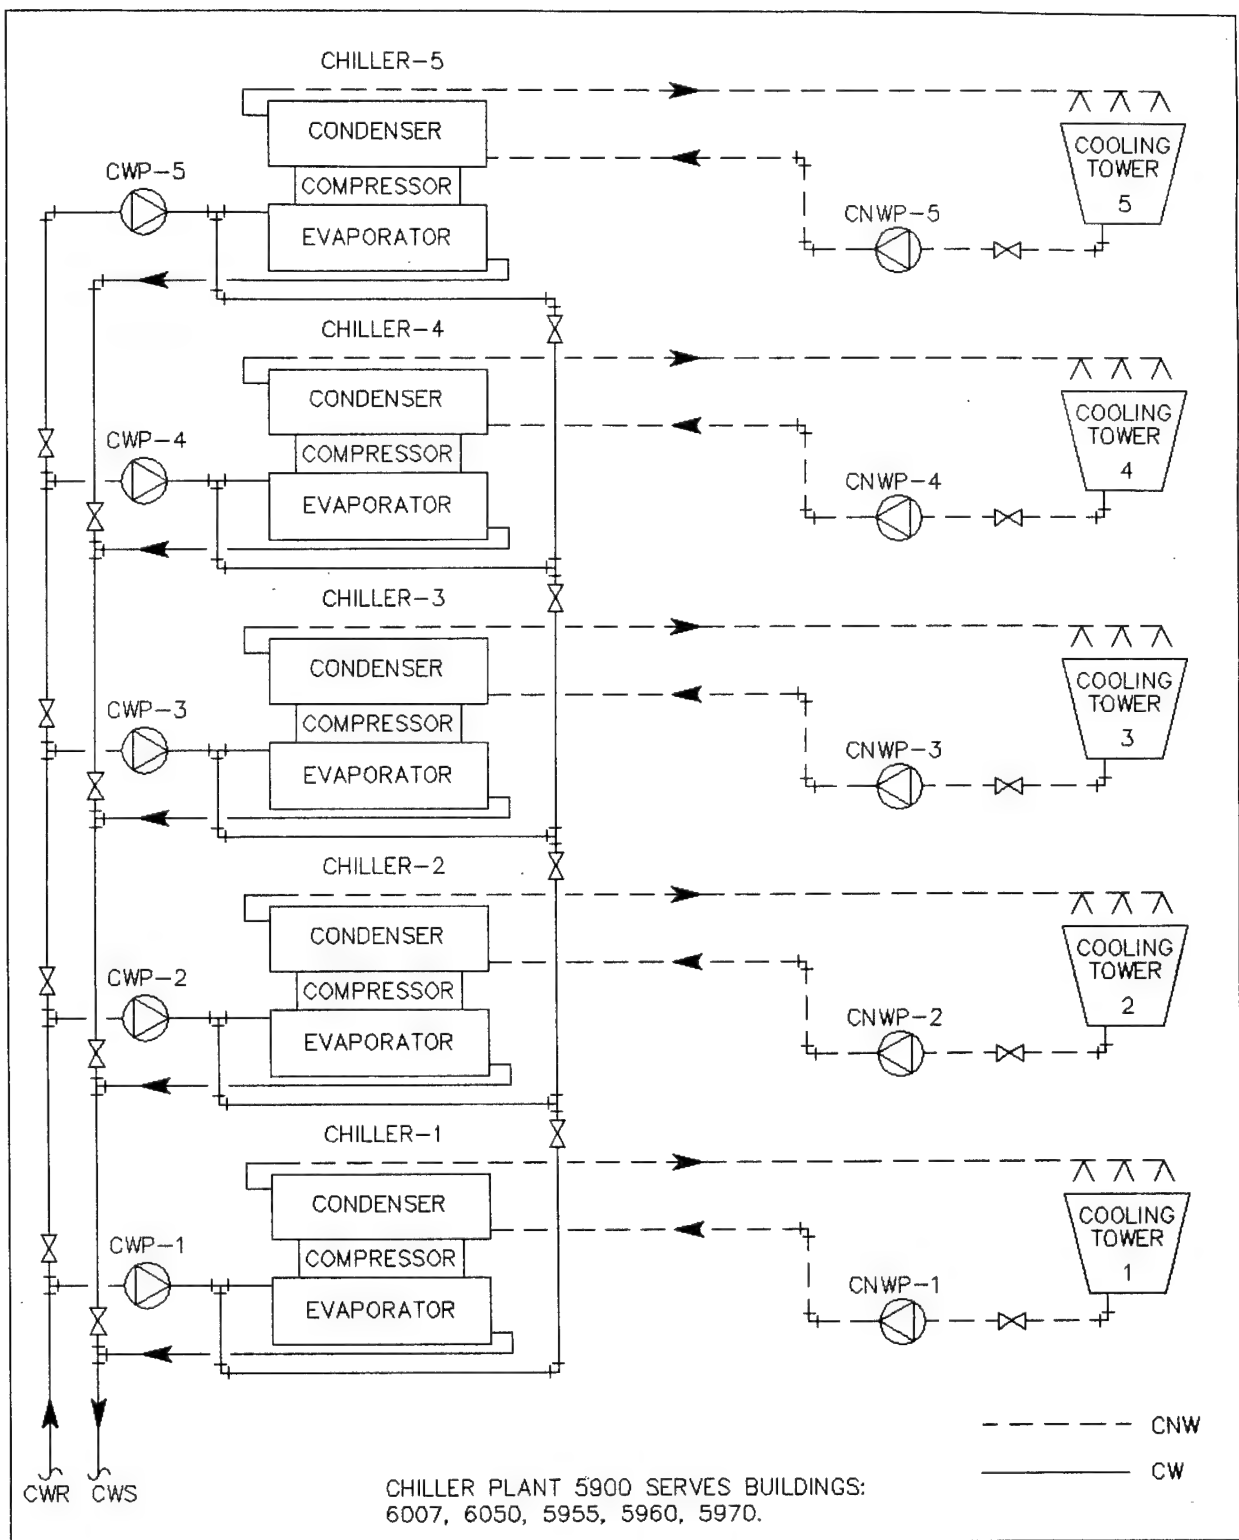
SCHEMATIC OF CHILLERS, CENTRAL PLANT 5900
